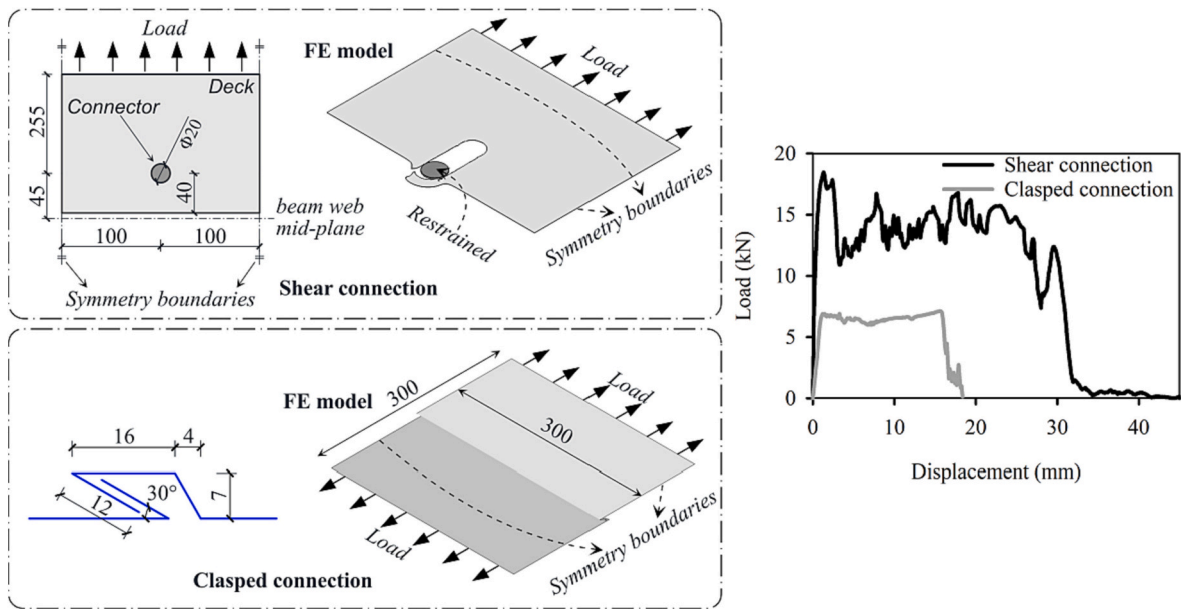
HF models for conventional floor deck connections (unit: mm).
